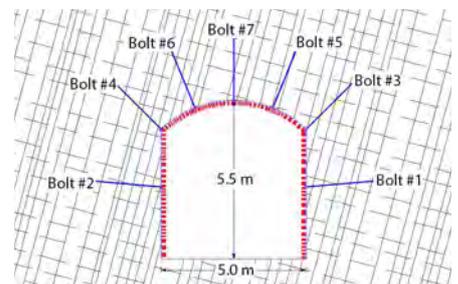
5 x 5.5 m arched tunnel in jointed rock mass, supported by rockbolts (Split-Sets) and liner (shotcrete)
